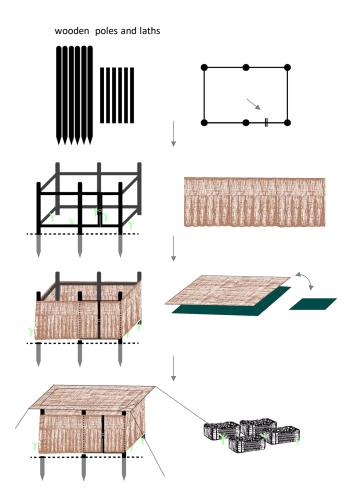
Illustration of the construction of the upscaled 600L charcoal cooler that was built and tested during the described field experiment.
